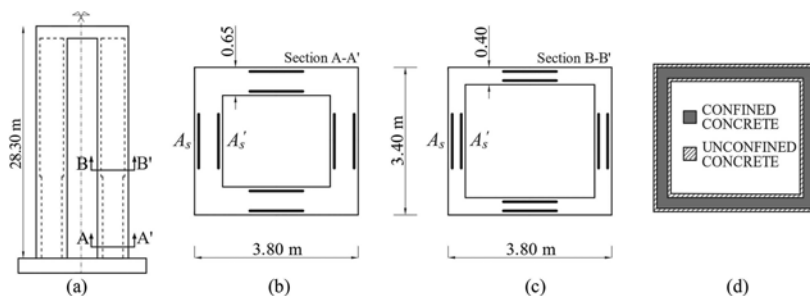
(a) RC bridge pier; (b) cross-section A-A'; (c) cross-section B-B'; (d) concrete confinement.
